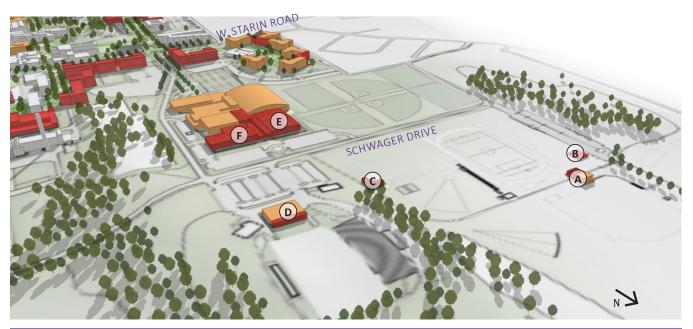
AERIAL VIEW OF PROPOSED PLAN LOOKING SOUTHWEST
